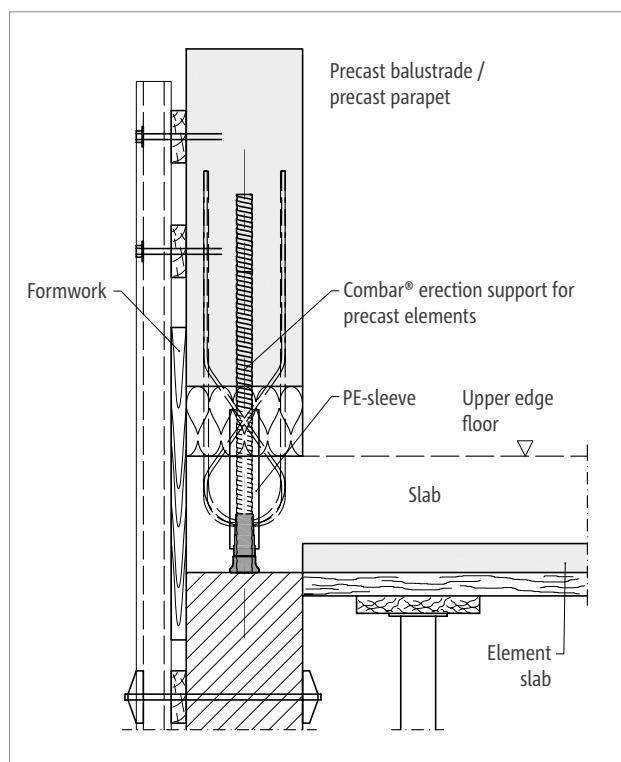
Schöck Combar® erection support for precast elements: Installation in a precast concrete parapet; section
